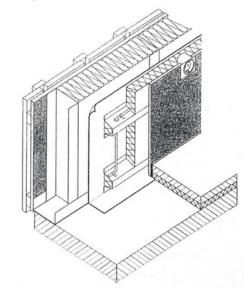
Structural detail of an inside installation plane with undisturbed airtight planel
